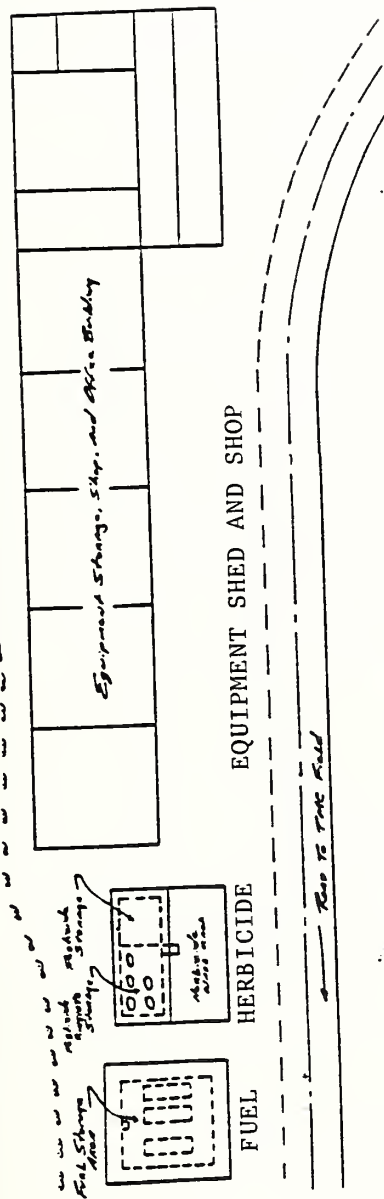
Equipment and storage facilities constructed at Jamie L. Whitten Plant Materials Center, Coffeeville, MS, 1991. The shed and shop building is 210 feet long and 30 feet wide.
